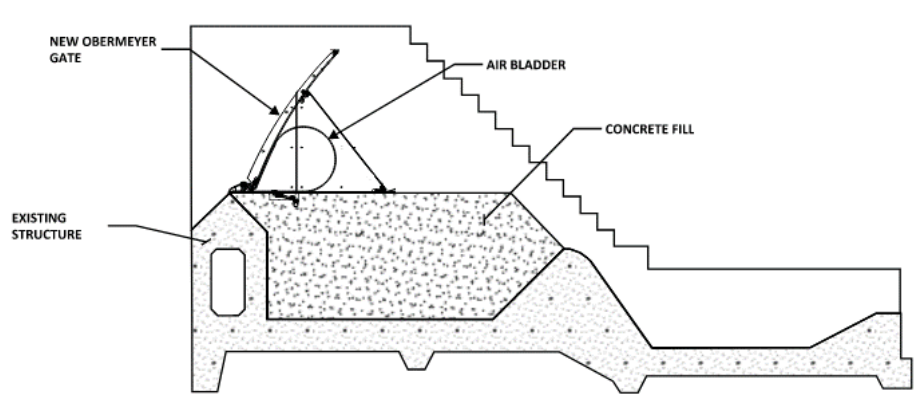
Obermeyer Gate Cross-Sections (Open)
